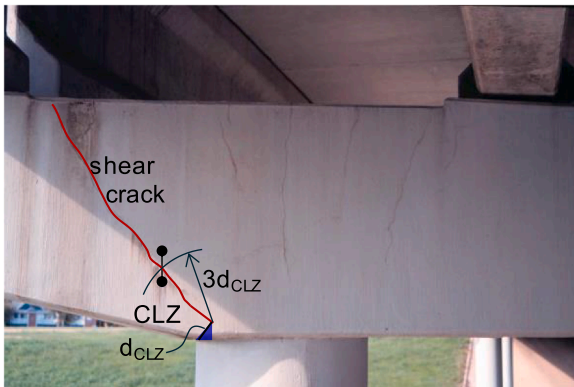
Deep pier cap beam with a major diagonal shear crack (adapted from Bracci et al., 2000 [1]).
